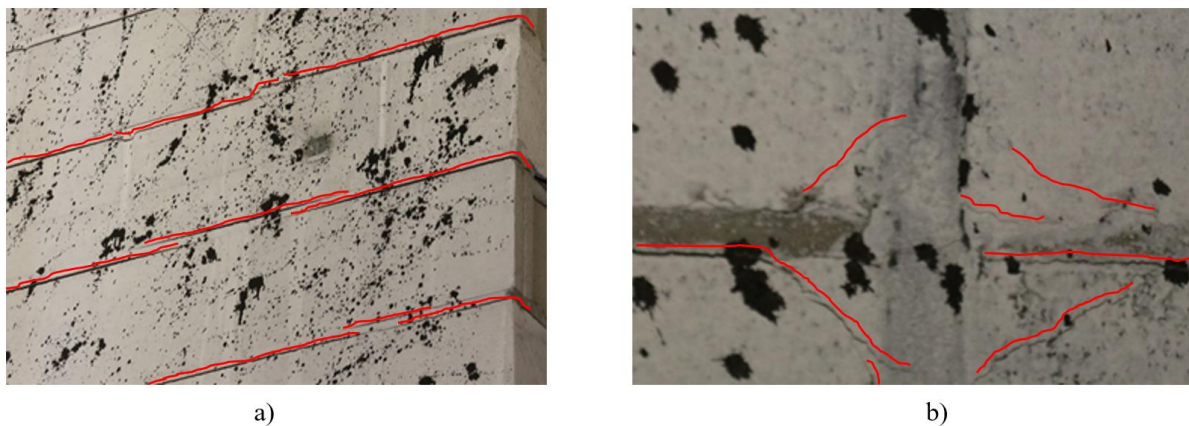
Cracking of walls at twice the yield displacement: a) horizontal mortar joint cracks in Wall CH7800a; b) herring bone cracking in Wall NH7800a
